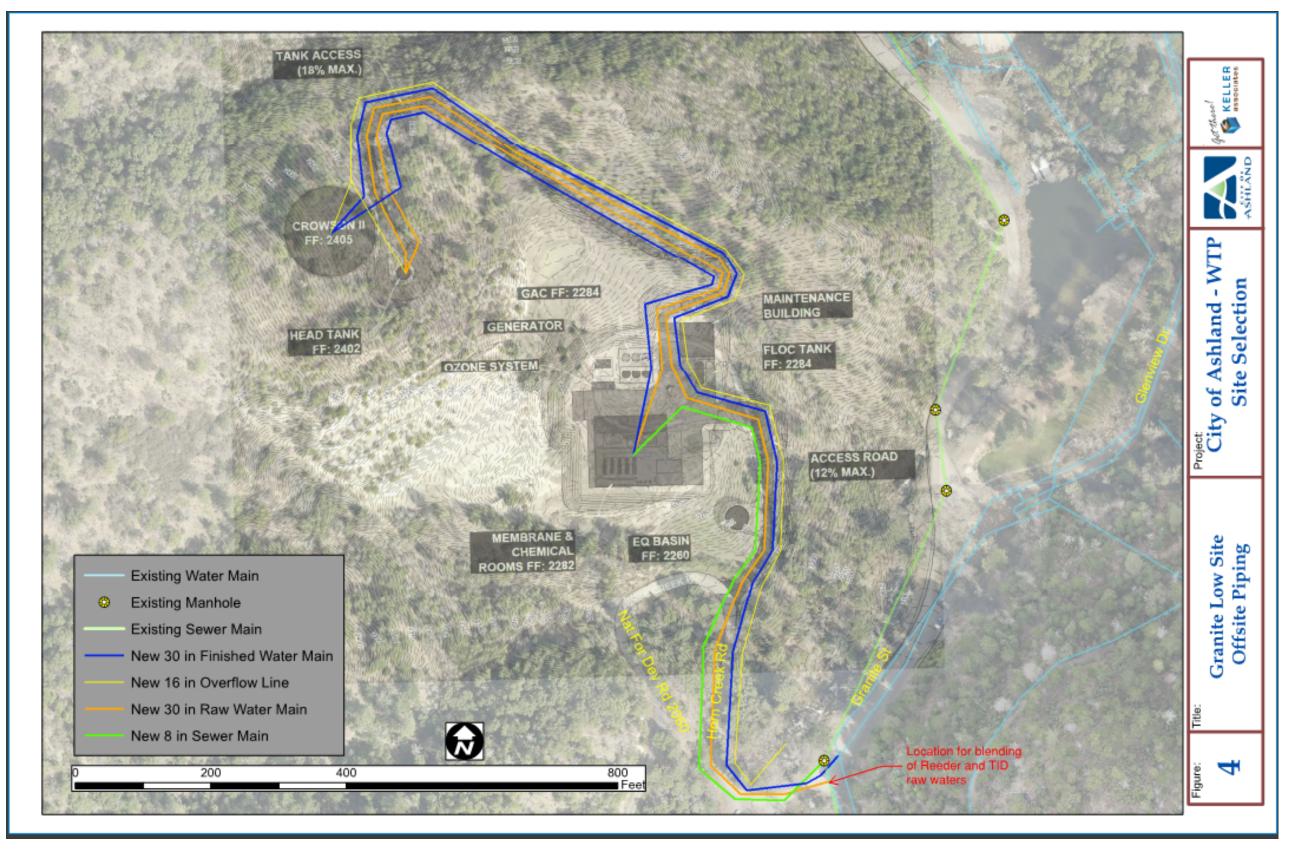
Potential Off-Site Piping Connections for Granite Low Site
